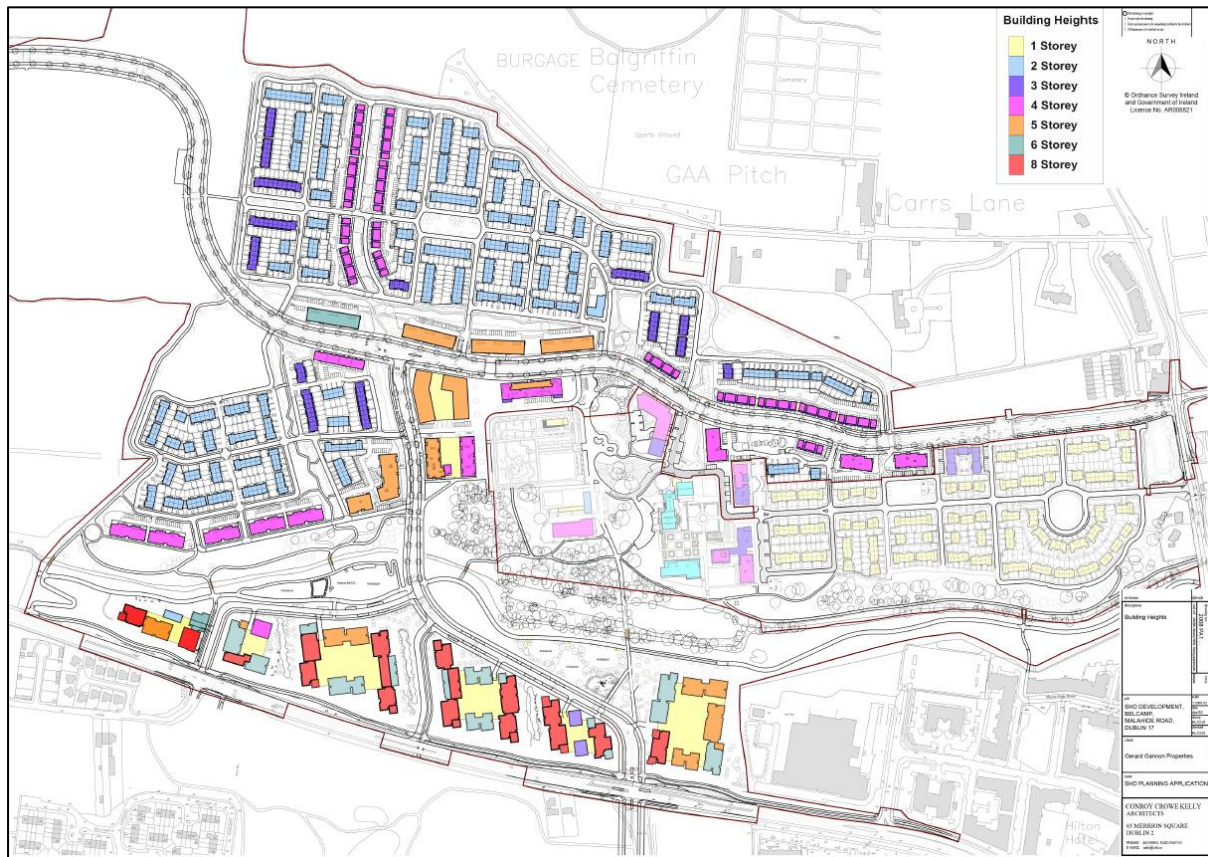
Proposed Building Heights for development (Source: CCK)
